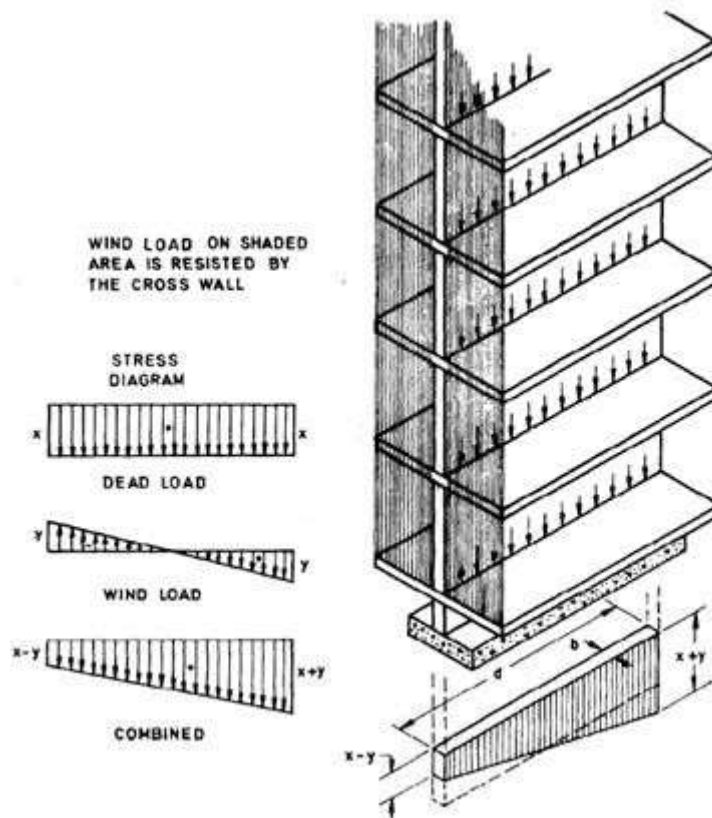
Stress Pattern in Cross Wall Acting as Shear Wall
